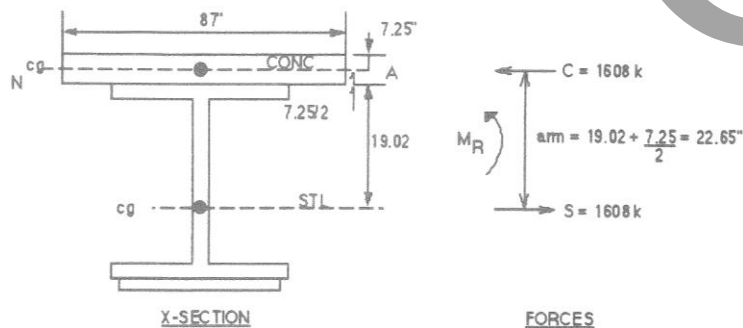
B.1.6.3-1—Cross Section—Interior Stringer, for Determining Plastic Moment Capacity, M_p
